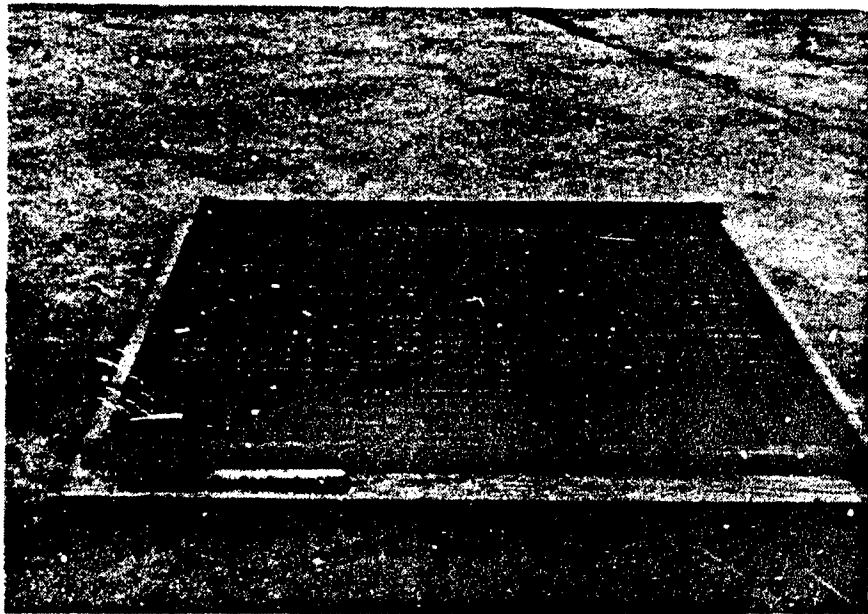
Plywood Form for Upper Concrete Slab.
